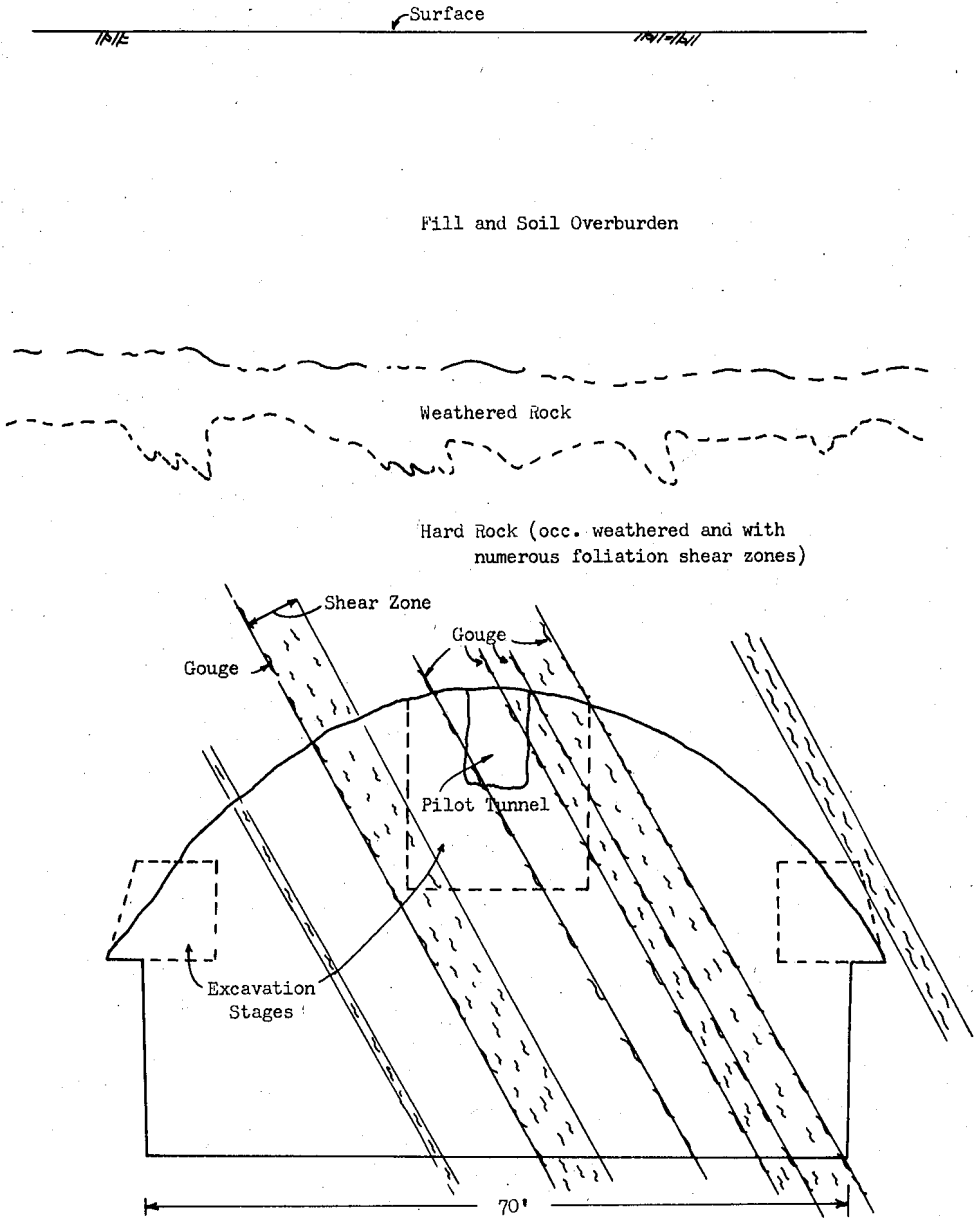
Cross Section DuPont Circle Metro Station, Washington, D.C., Showing Typical Foliation Shear Zones (Schematic after Cording and Deere, 1972).
